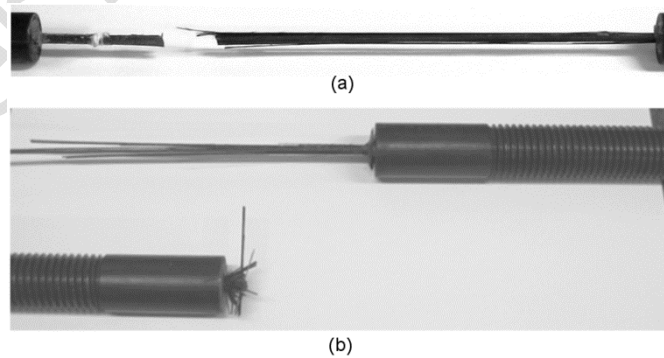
Pure axial failure modes (a) free length failure in SW specimen and (b) anchorage failure in control specimen
